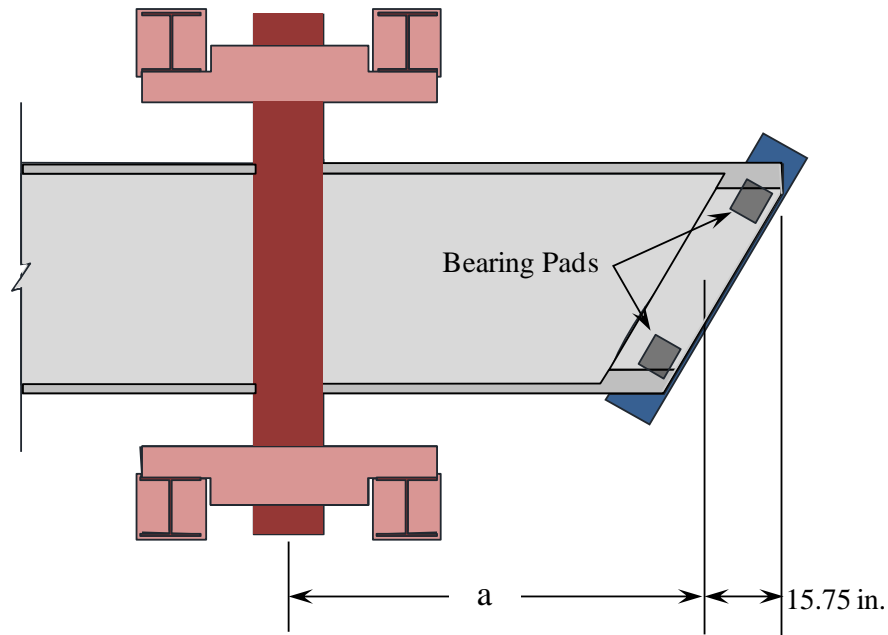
Shear Span definition for skewed supports when two bearing pads were used.
